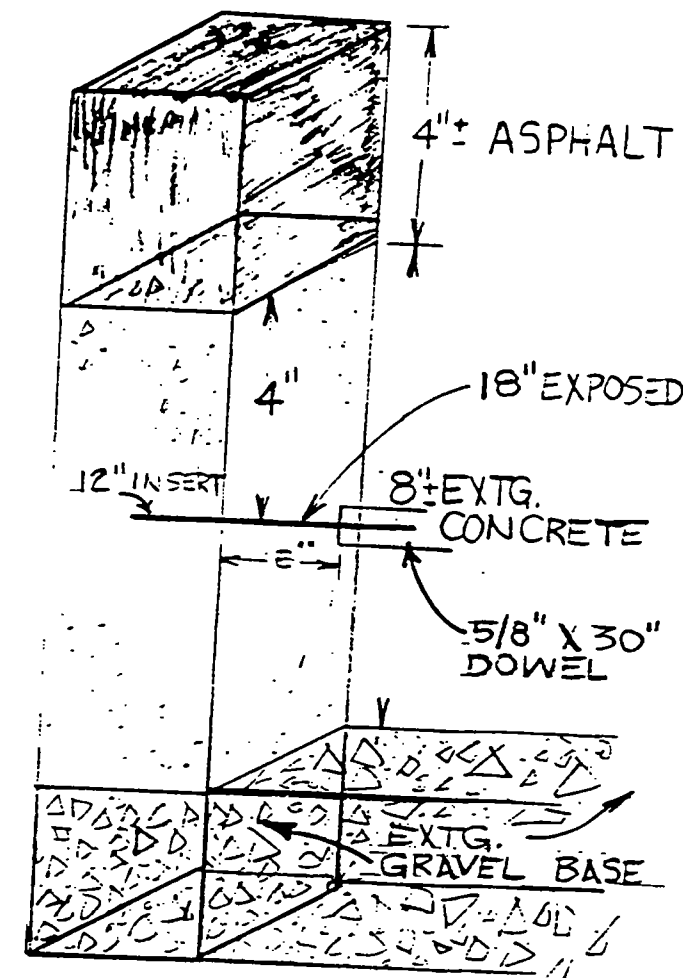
PLAN VIEW (TRENCH CUT-OUT)
